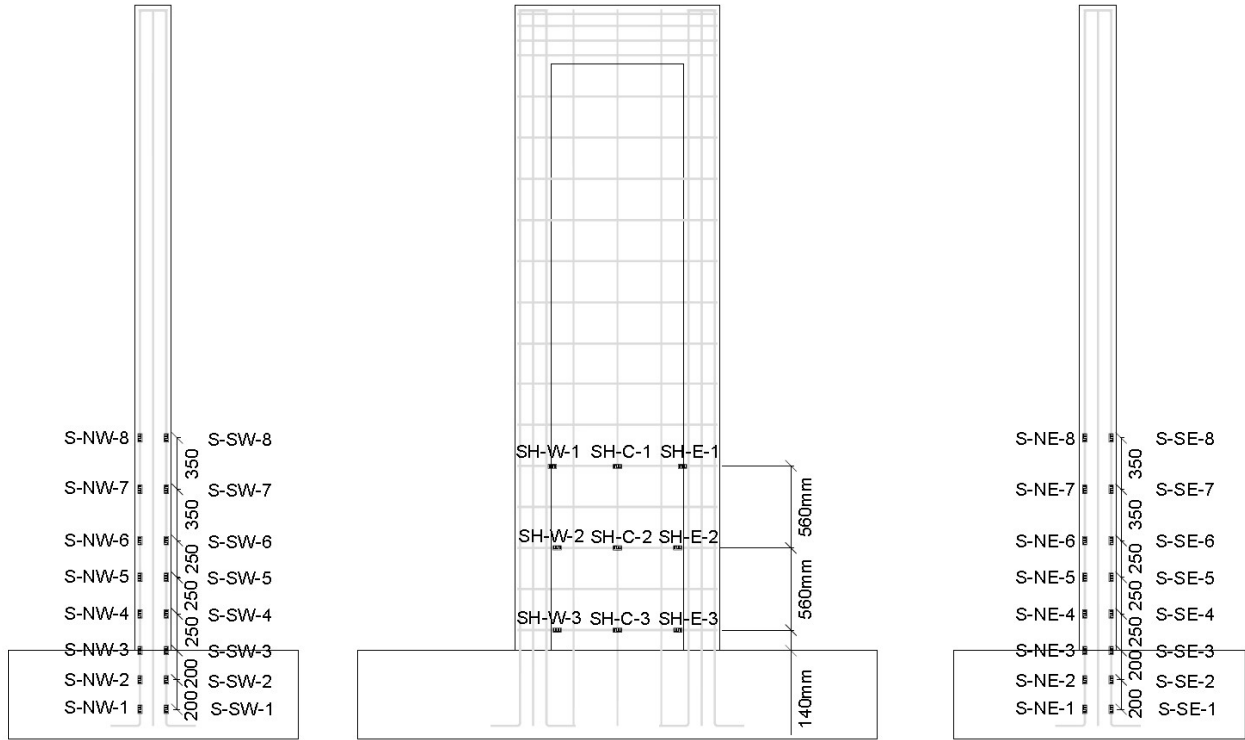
Wall W1HS strain gauge instrumentation plan
